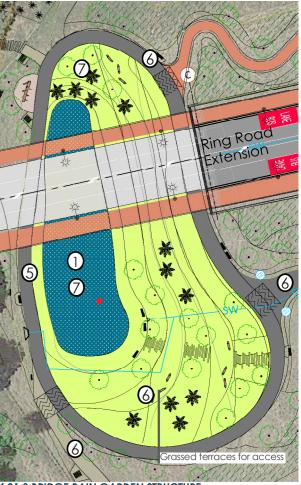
BRIDGE RAIN GARDEN STRUCTURE
